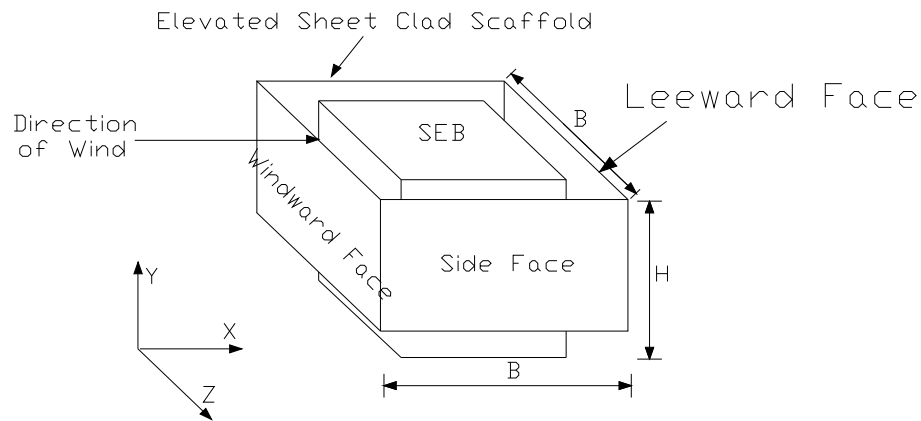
Scaled cubical SEB surrounded by elevated sheet clad scaffold
